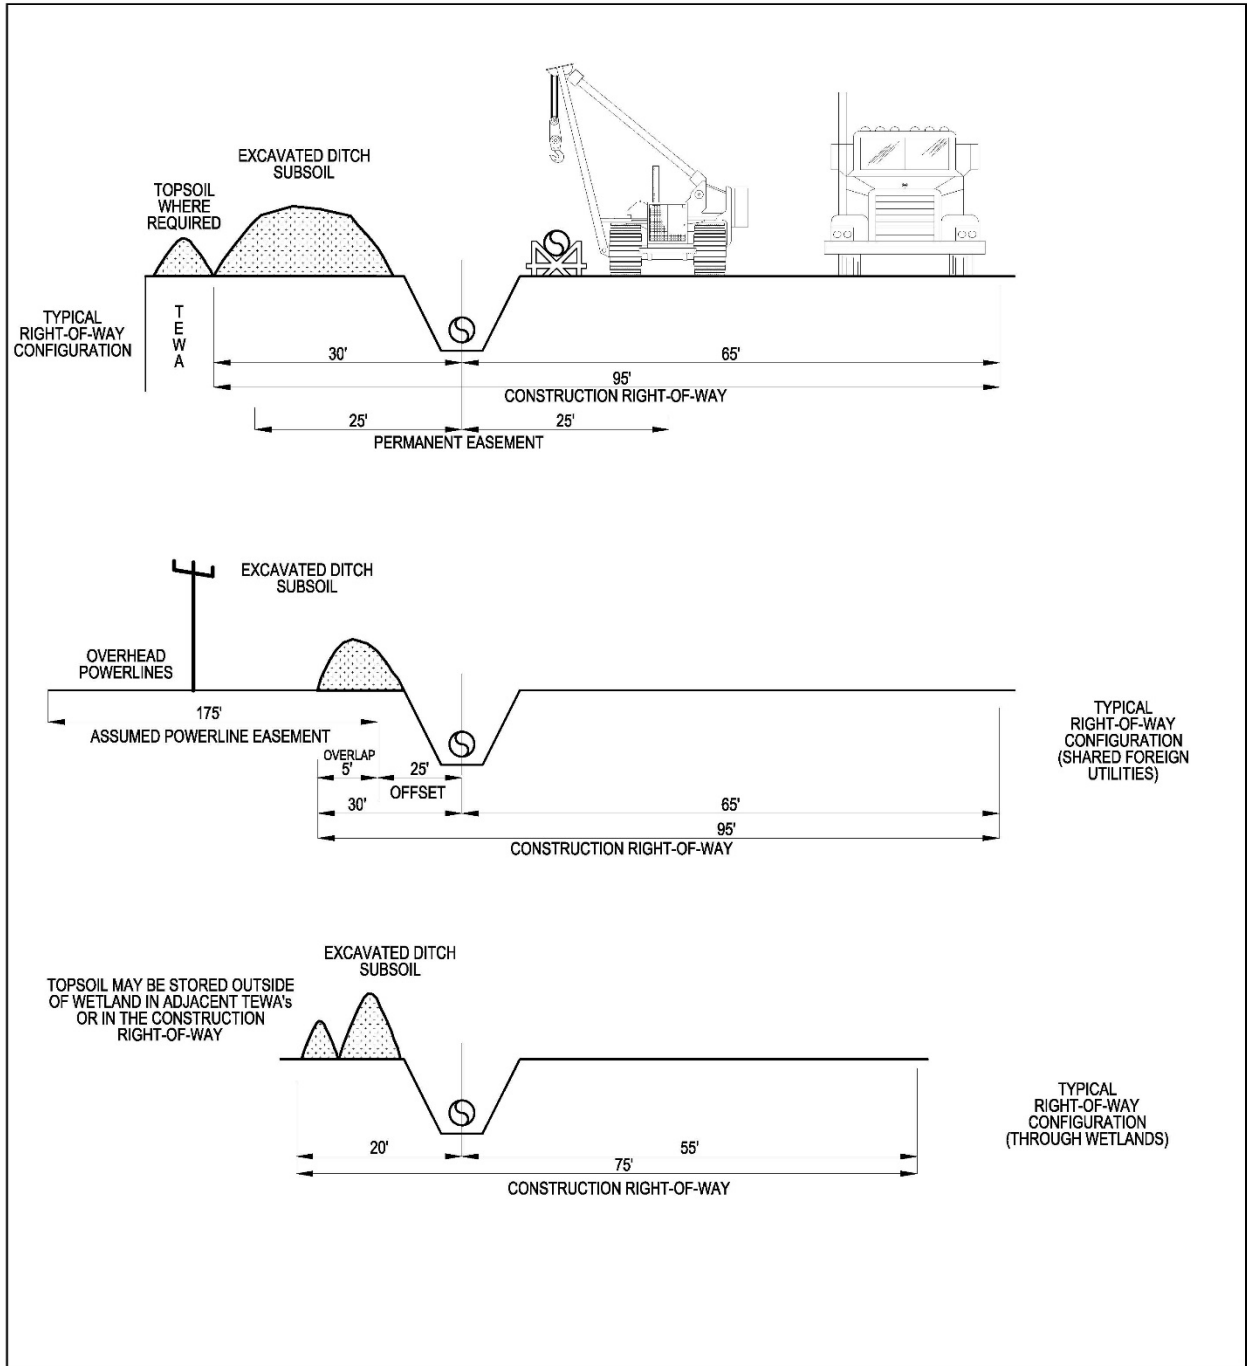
Typical Pipeline Right-of-Way Cross Sections
